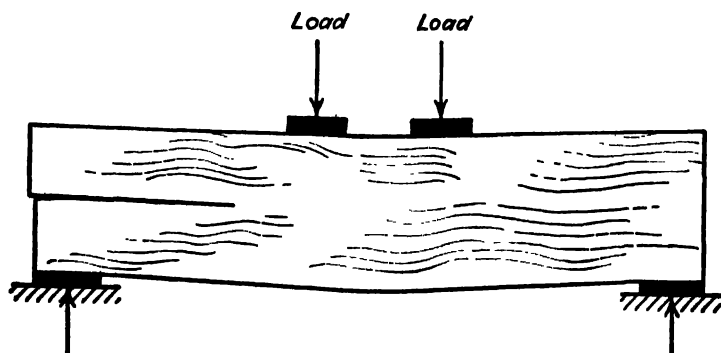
Failure of wood beam by horizontal shear. Shear crack can be seen extending along the beam at about mid-depth.
